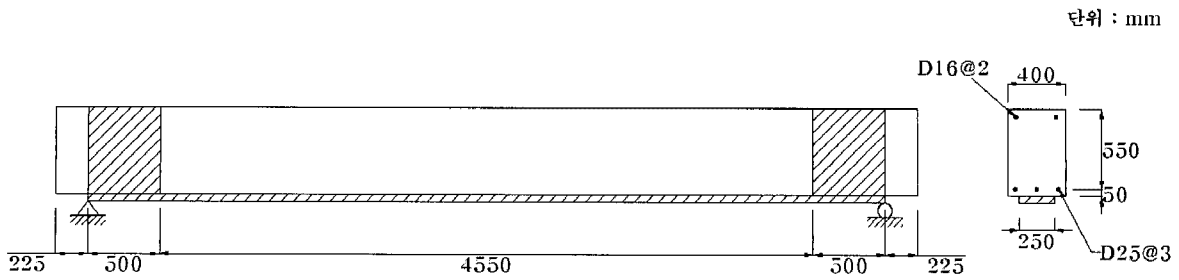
Dimensions of Strengthened RC Beam and Cross Section
